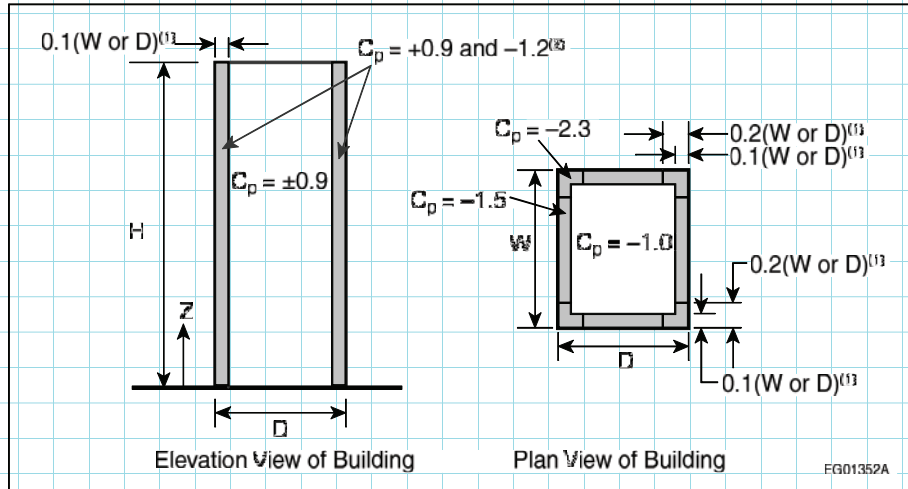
(4) Values of C_p for roof and wall claddings and secondary structural supports of cladding on rectangular buildings
